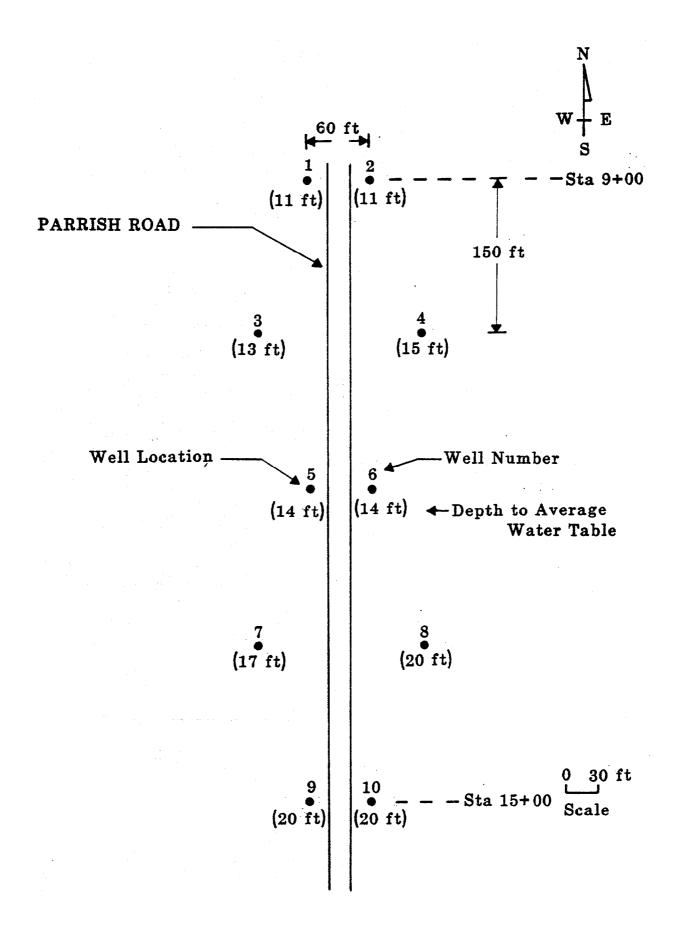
Layout of Monitoring Wells, Parrish Road.
